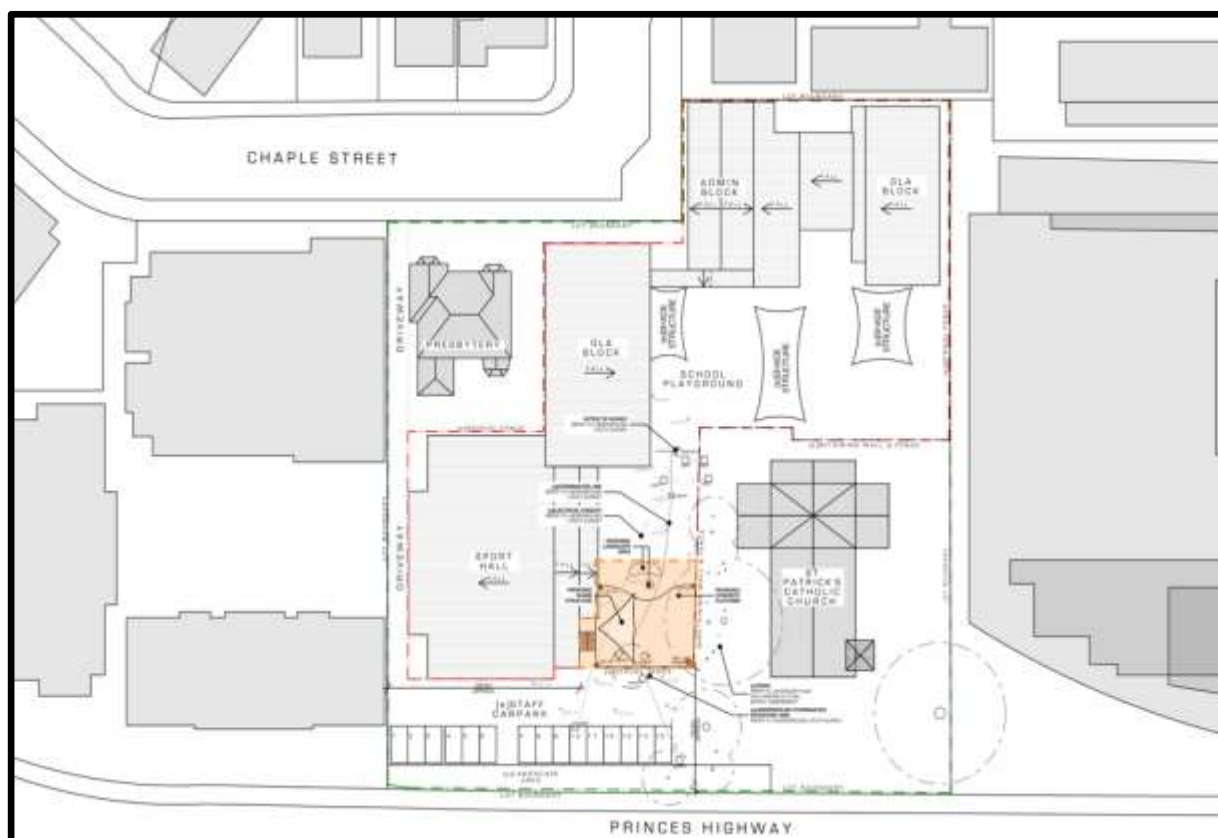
Site Plan showing the school, church and area where subject works are proposed (courtesy: OHD Landscape Architects, 2020)
